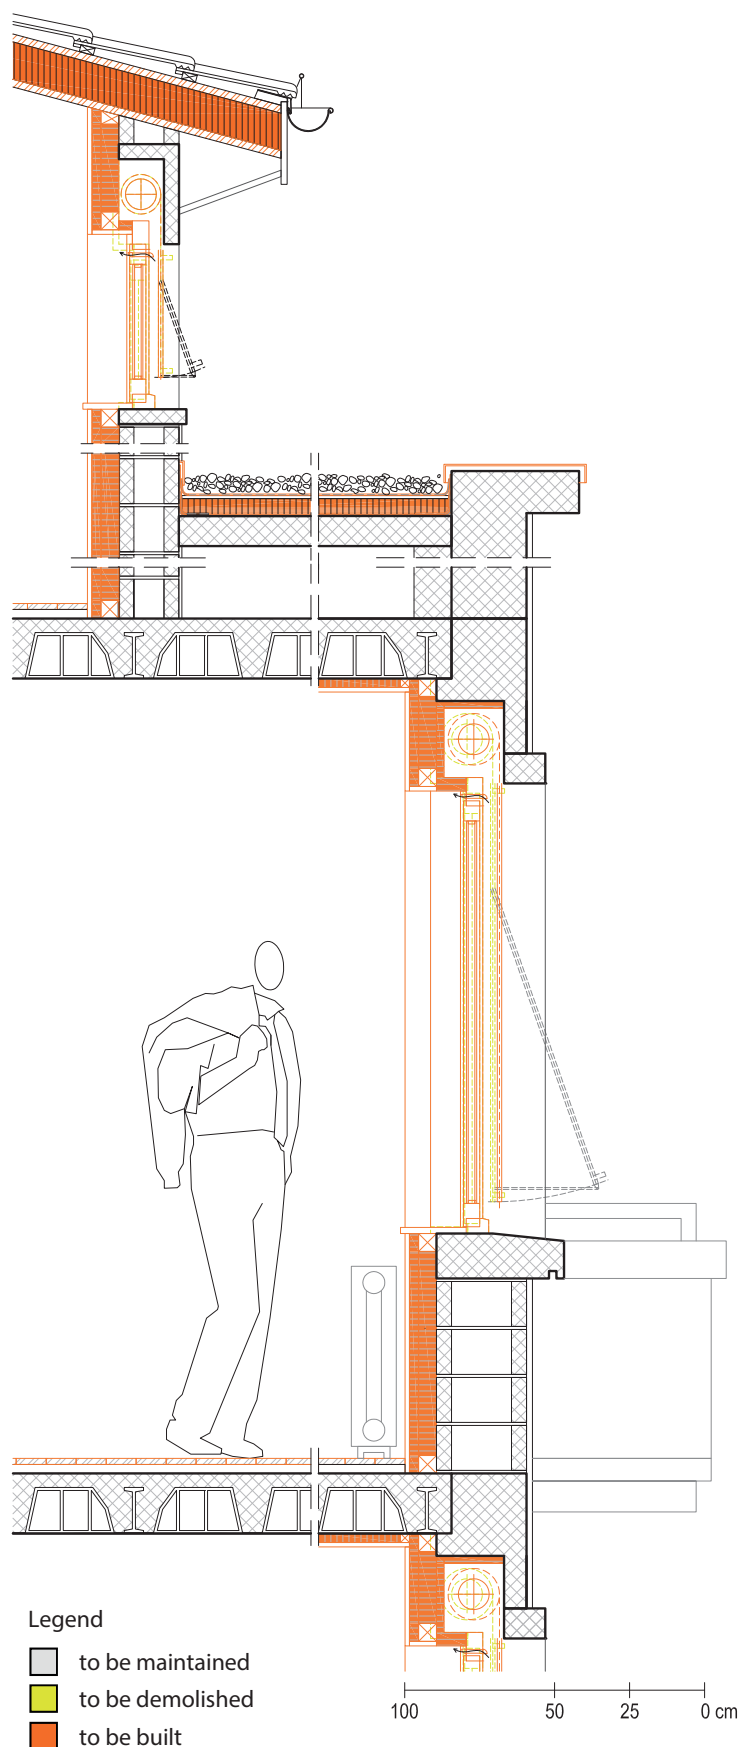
Façade constructive detail, S0 - Baseline, Archetype 2.
